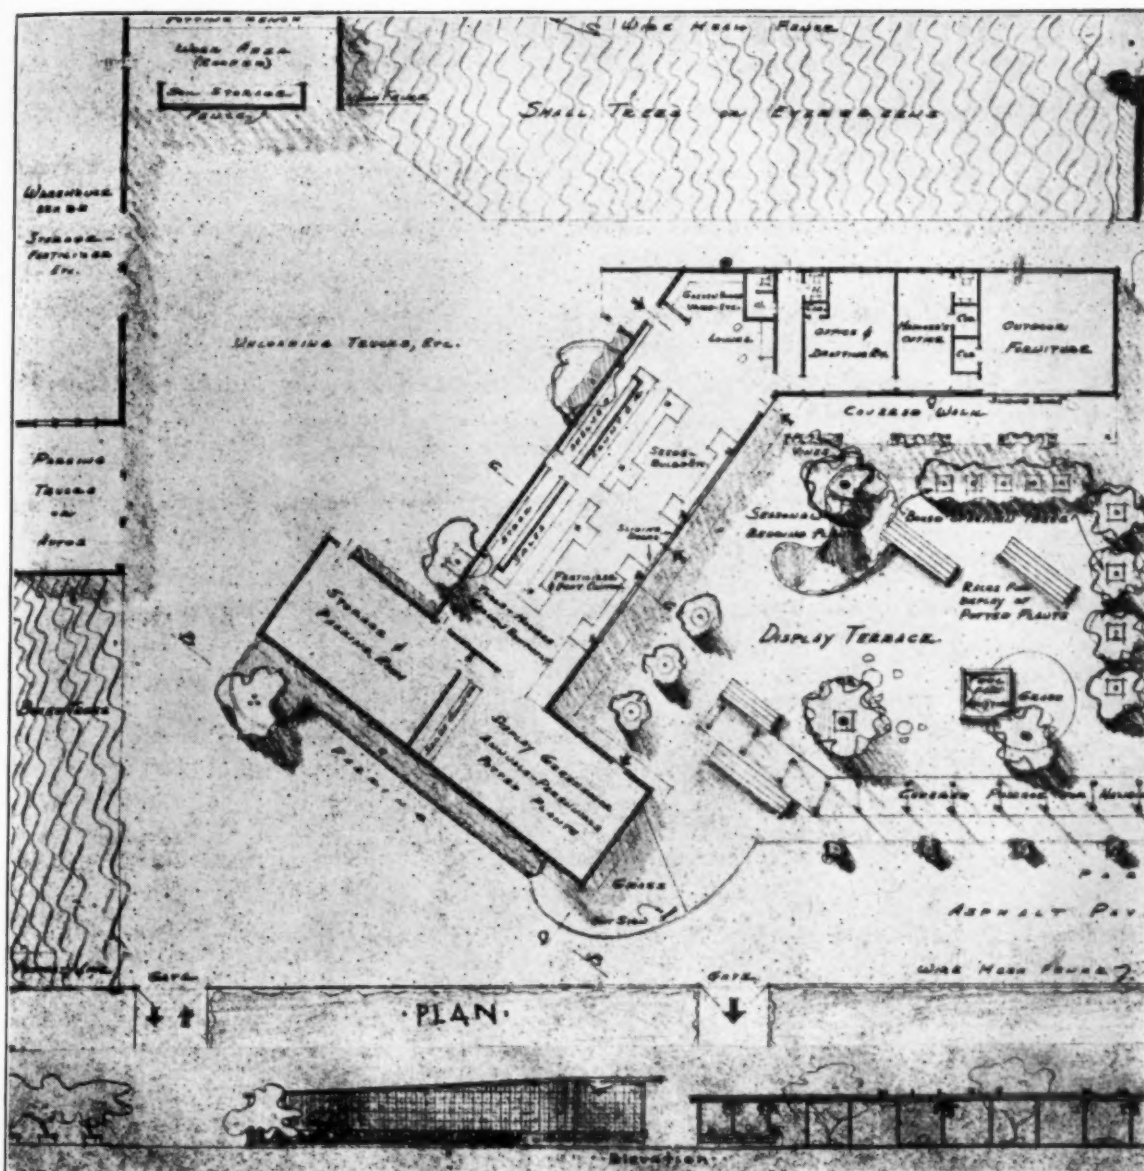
In true California style, this sales building and display terrace were worked out in the modern manner by Thomas D. Church, of San Francisco. His plan won an honorable mention.
